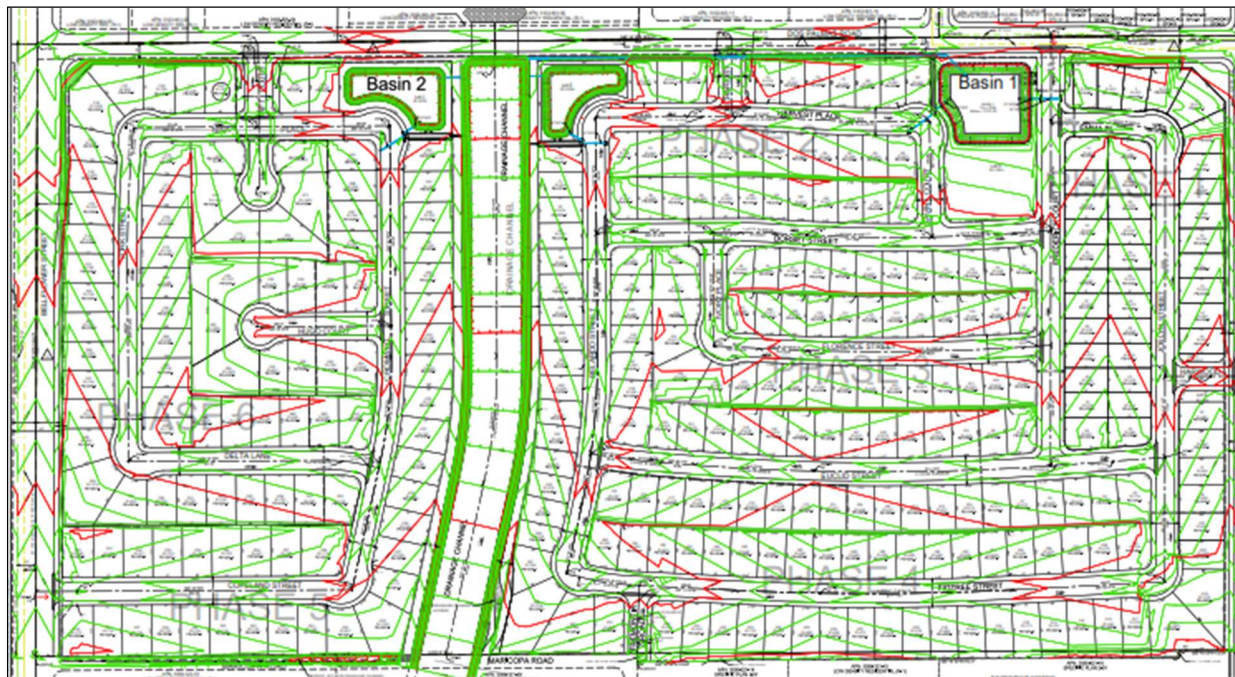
Site Plan – Proposed Housing Development - TTM 20262, Victorville, CA
